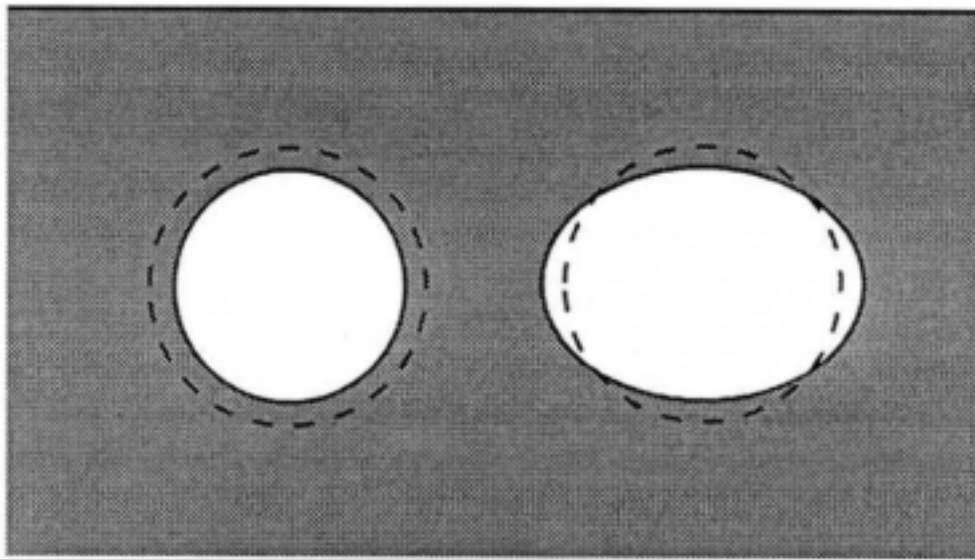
Contraction and ovalisation of a tunnel (Verrujit et al. 1996)
